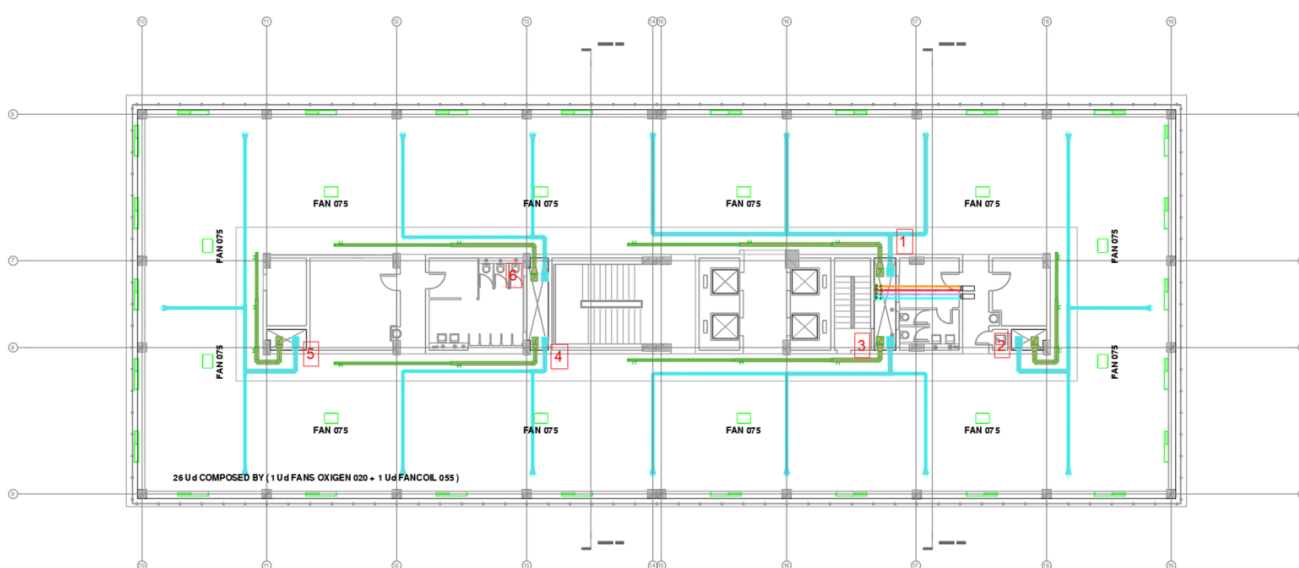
Plan view of standard plan, alternative 3 (source: AIGUASOL).
